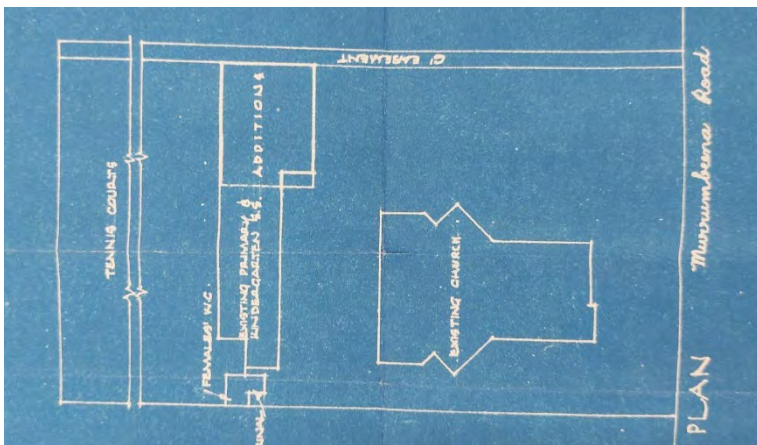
Site plan showing the proposed memorial hall to the north of the kindergarten hall, May 1953, by architect Louis R Williams (Source: PROV, PB File)
